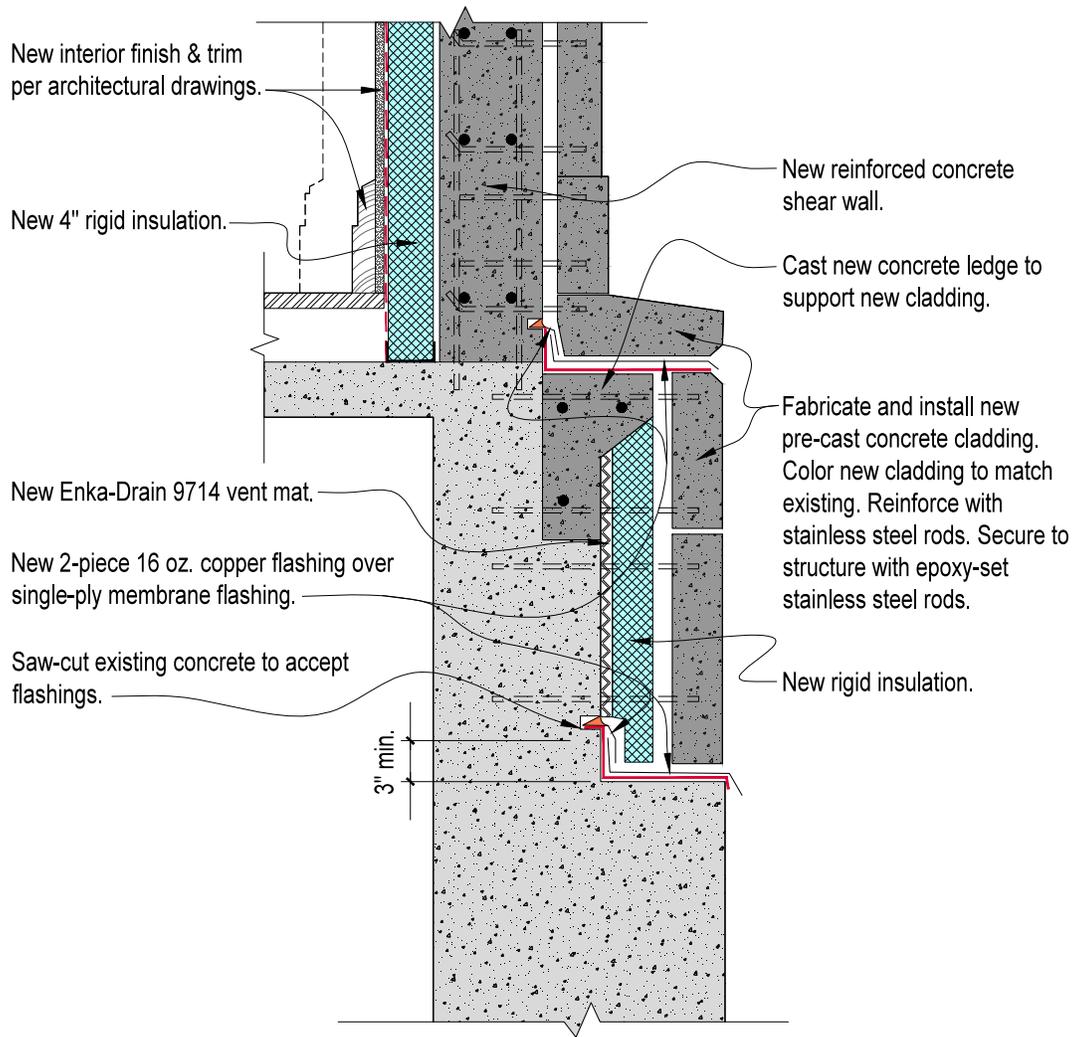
(8): Option 2 New Masonry Veneer Appr. at Stone Wall Base, S. Side
